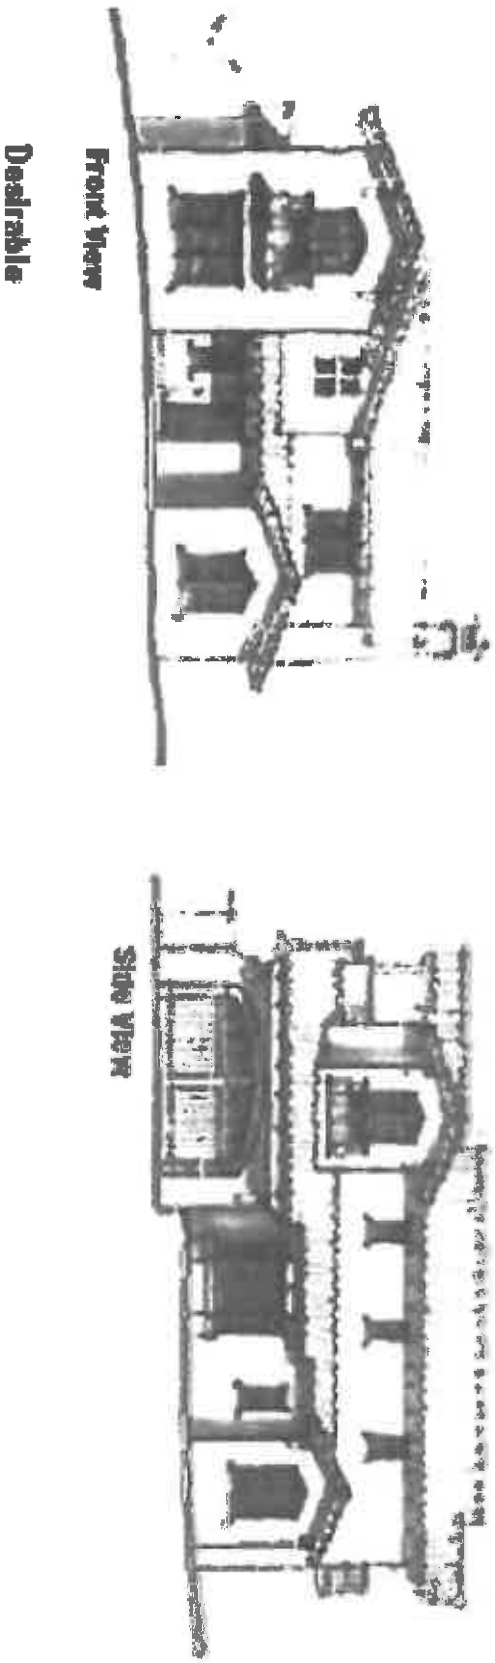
Both the front and the street-side elevations of this Spanish-style home have been emphasized with upper story setbacks, projecting room elements, balconies, bay windows, and substantial window framing.
